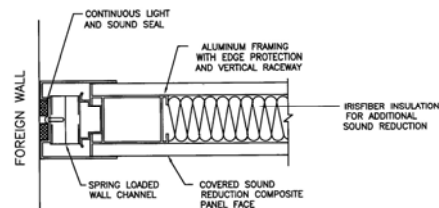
IrisWall to Foreign Wall Connection, EWS
